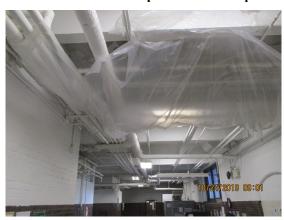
Cracks and Exposed Ends on Pipe Insulation Wide View 1
